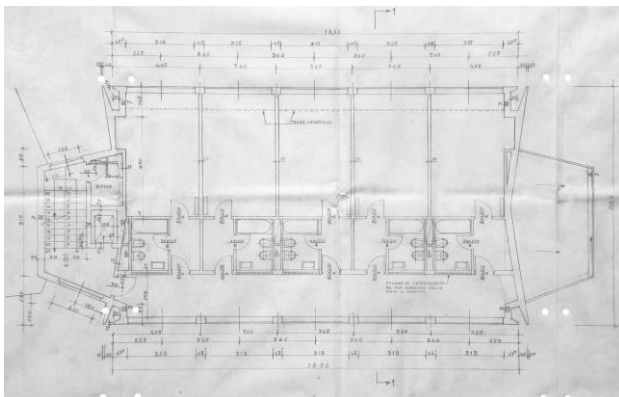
Part of the original drawing of the Garzanti Foundation Institution in Forlì (Board n. 17. Typical floor plan, CSAC, University of Parma).
